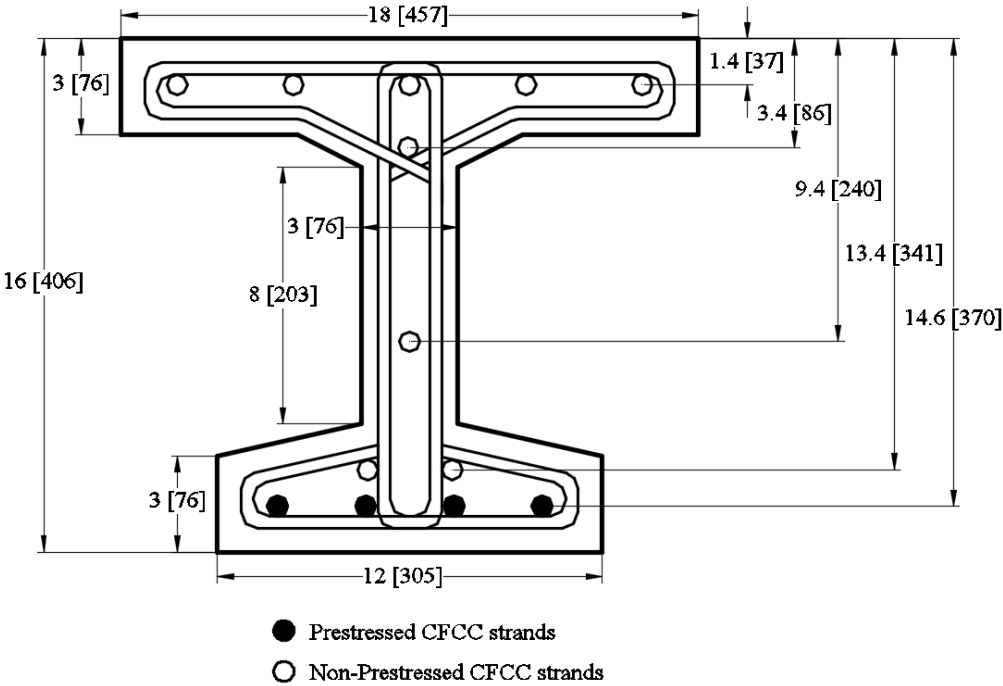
Cross-section of prestressed decked bulb T-beam, all dimensions are in in. [mm]
